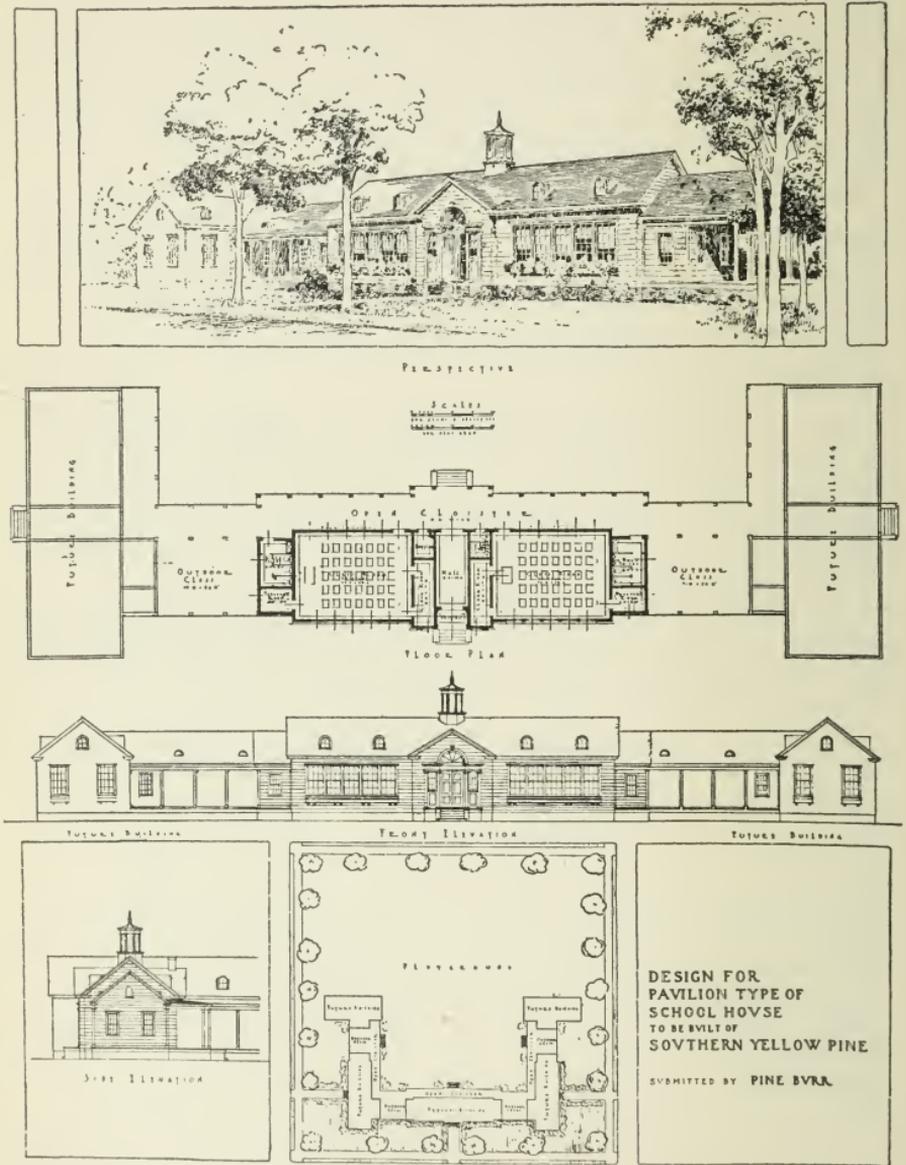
First Prize Pavilion School by Nevil C. Settoon,
